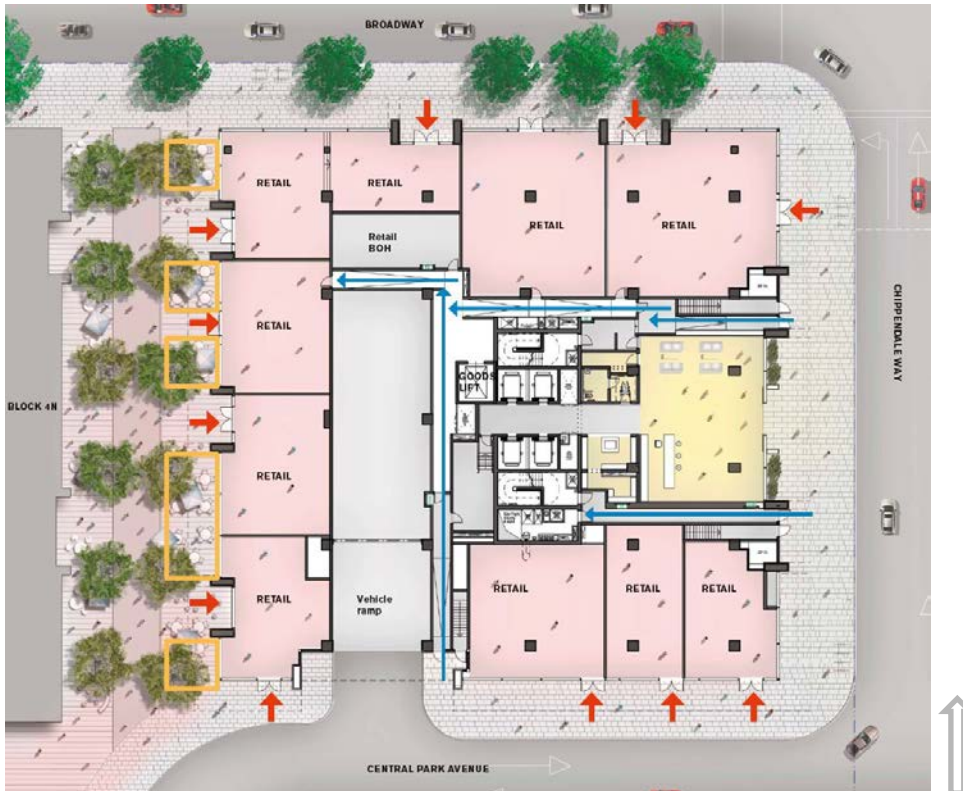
Arrangement of non-residential/retail uses on the ground floor.
